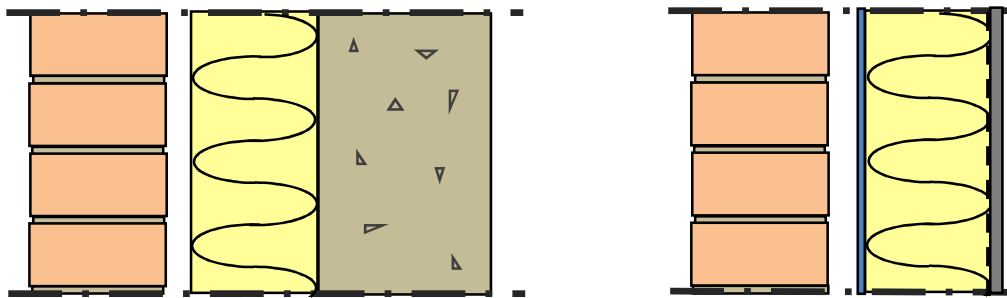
a) Original exterior load-bearing wall (North & South). b) Original curtain wall (East).
